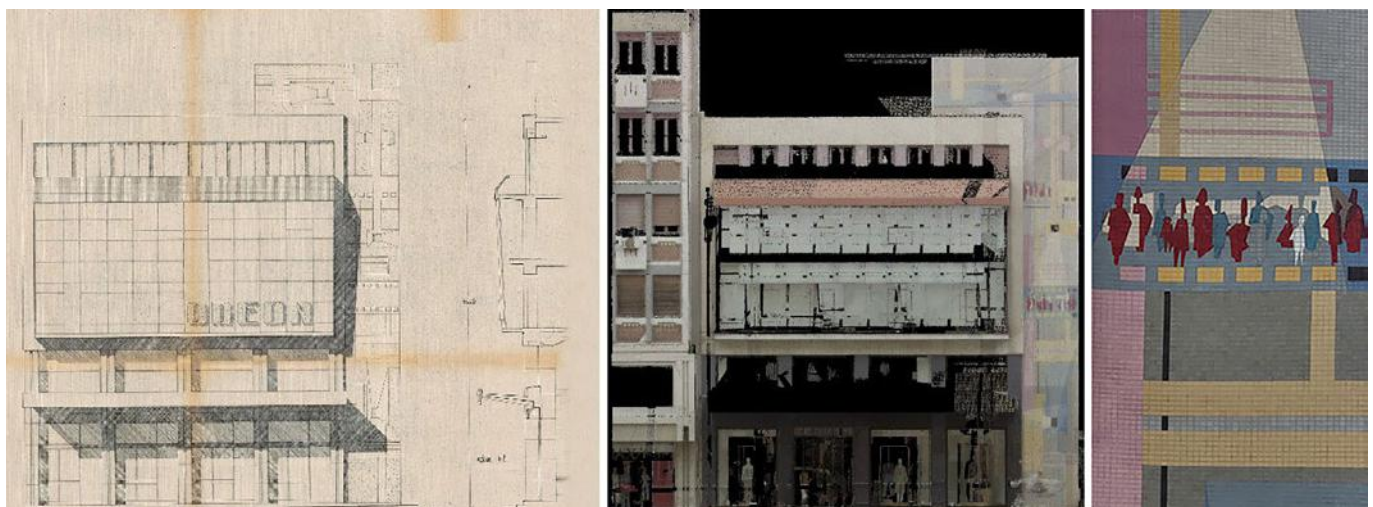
G. Lo Jacono, *The Odeon cinema in Messina. Main elevation and section, 1959 and the current façade rendered through the orthophoto points cloud. Detail of the decorative mosaic. Sources: left, Archive of the Messina town planning office; center and right, elaborations by the authors, 2023.
